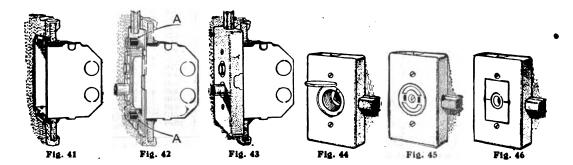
is a sectional view showing a standard flush switch box installed in a wall in the usual manner. Fig. 42 shows the No. 551 Plate and any standard push switch mounted over the box shown in Fig. 41. Fig. 43 shows the assembly of push switch outlet complete with a No. 561 Cover.
